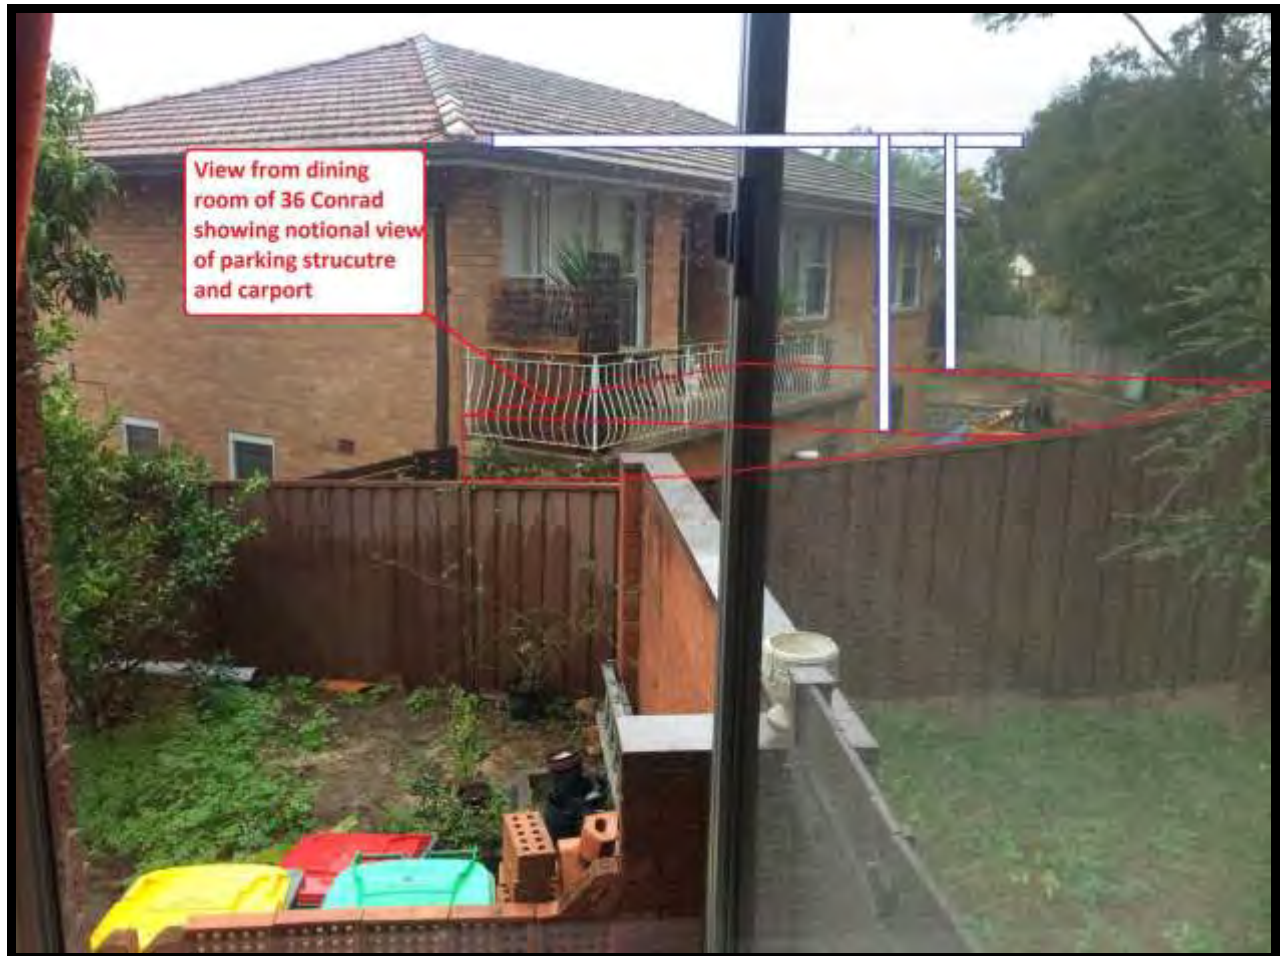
View from the elevated ground floor dining room of 36 Conrad Street. An indicative location of parking structure and carport is shown.
